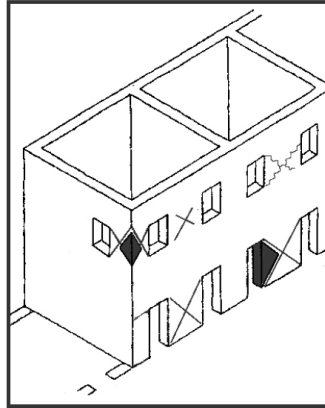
Possible in-plane damages of masonry structures due to shear; (Decanini, 2009c).
